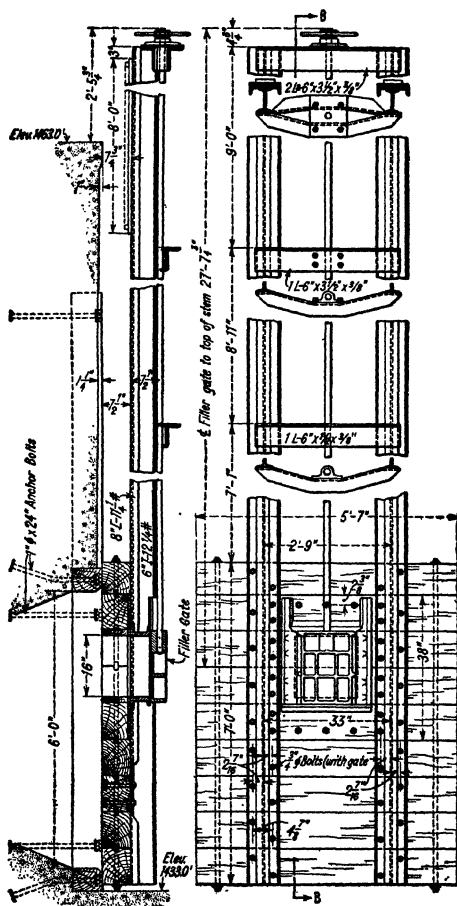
Timber Gate for Ordóñez Plant, Quito Electric Light and Power Co.
